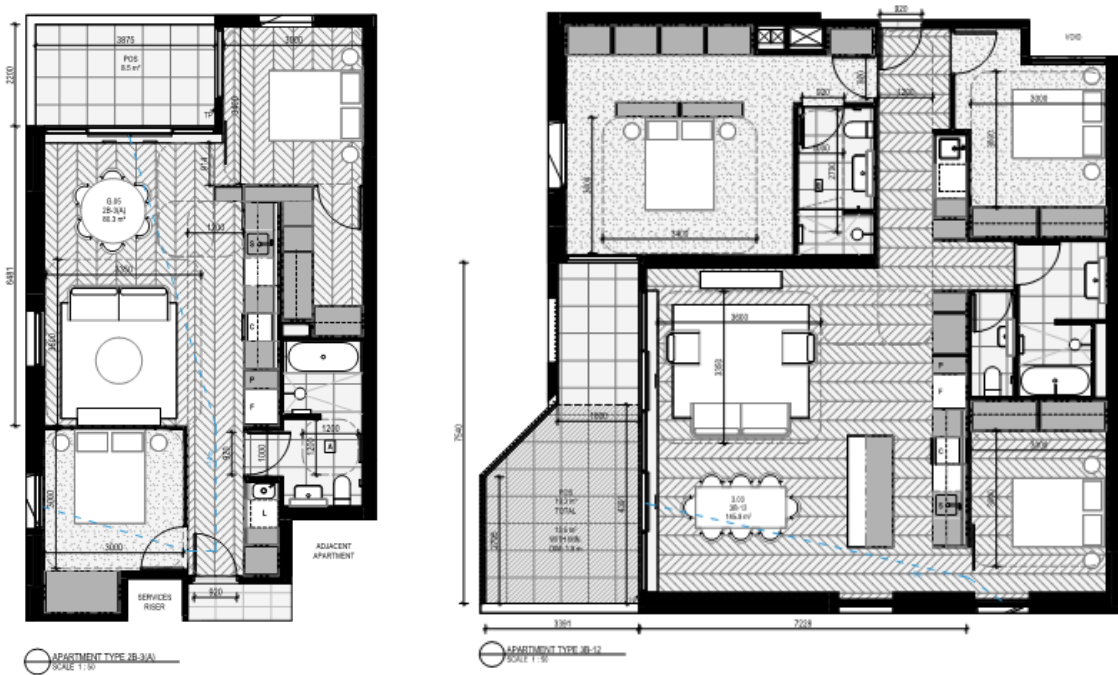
Typical 2- & 3-bedroom ADGV apartments
